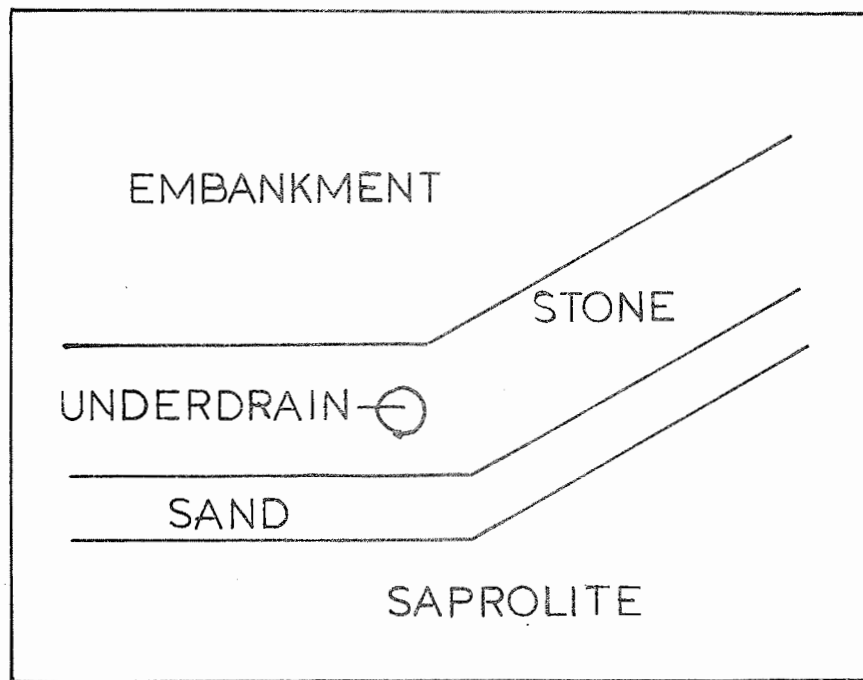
To provide drainage, a layer of sand and stone was placed under large embankments.
